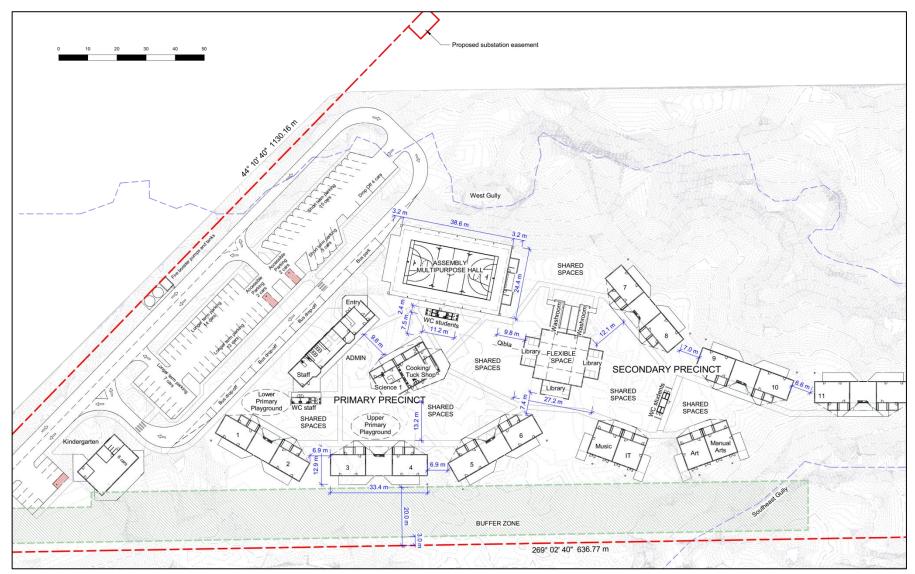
PROPOSED STAGE 6 (FINAL) PLAN
